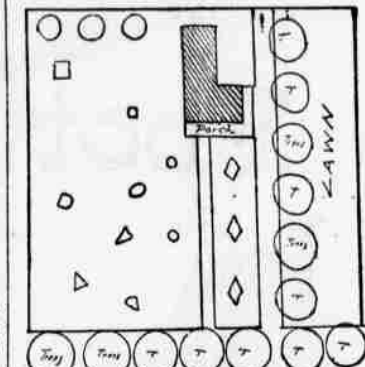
TYPICAL FARMYARD ARRANGEMENT.
